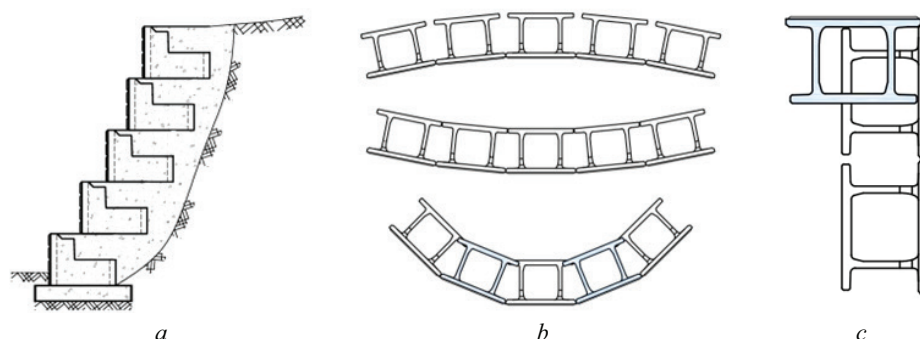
Retaining structure made of blocks filled with crushed stone: *a* — cross-section scheme; *b* — configurations in plan; *c* — fragment of the end section
